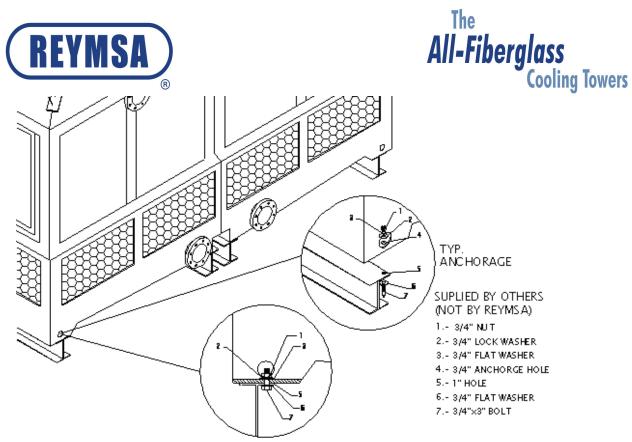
Installation - Typical Anchorage for Quadruple Fan Tower
